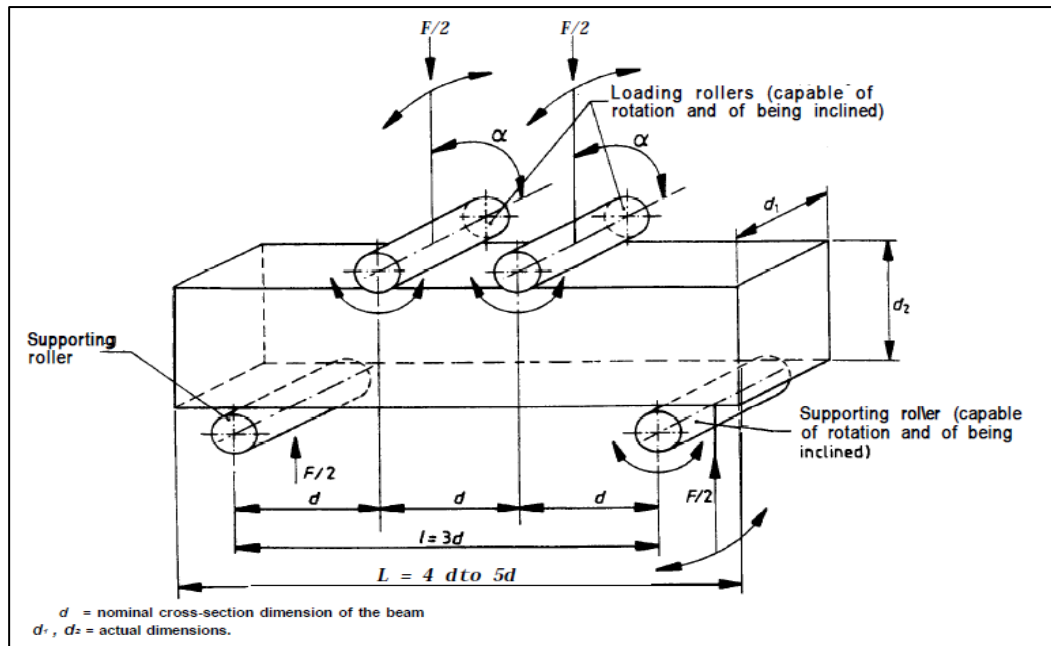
Arrangement of loading of test piece (two-point loading)
